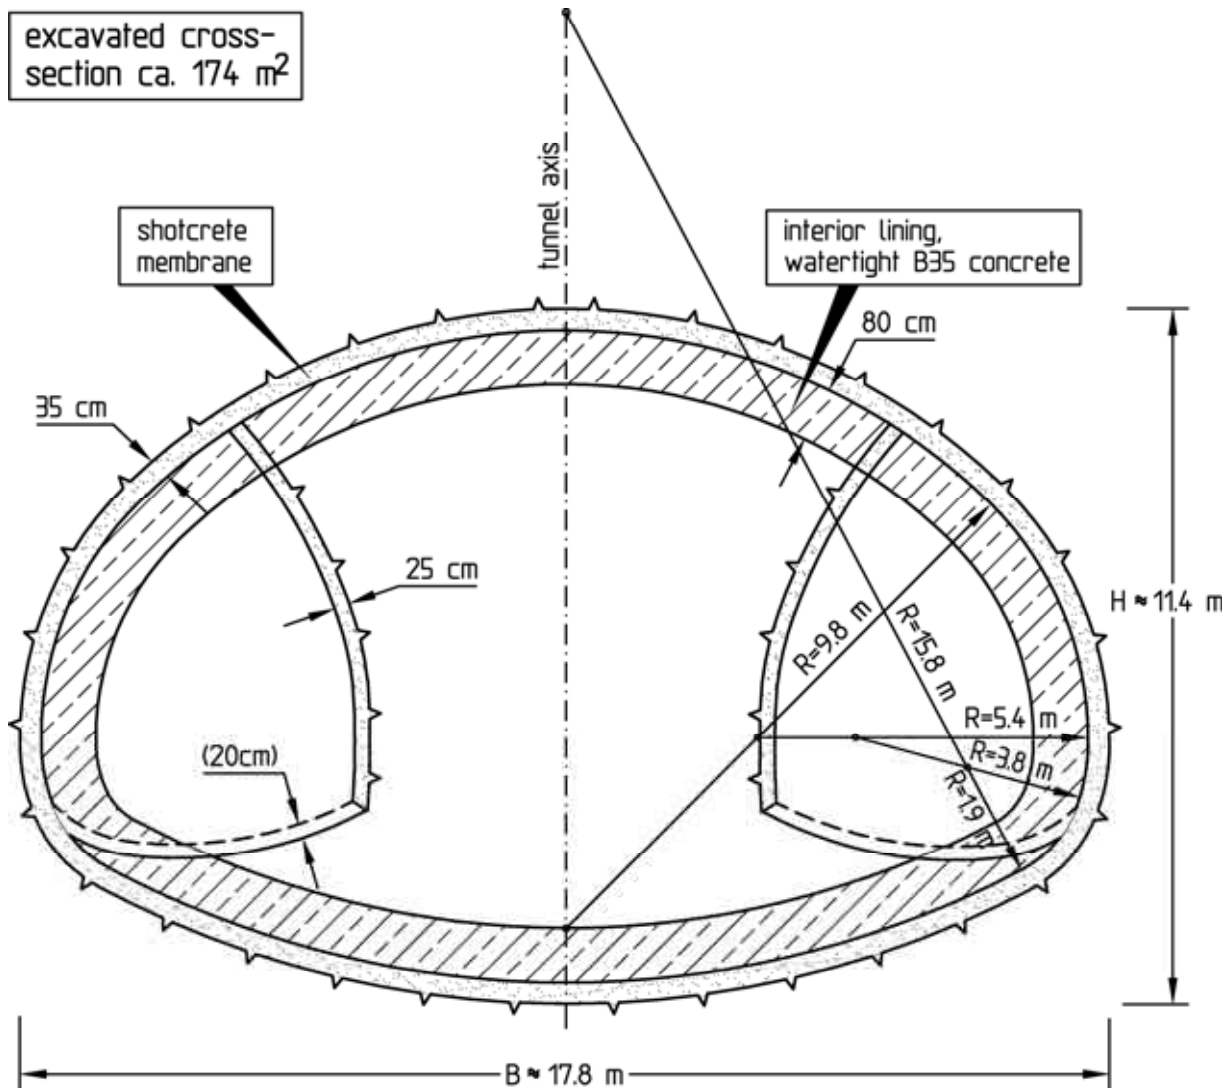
Enlarged cross-section at the beginning of the Killesberg-Messe station (km 0+860)
